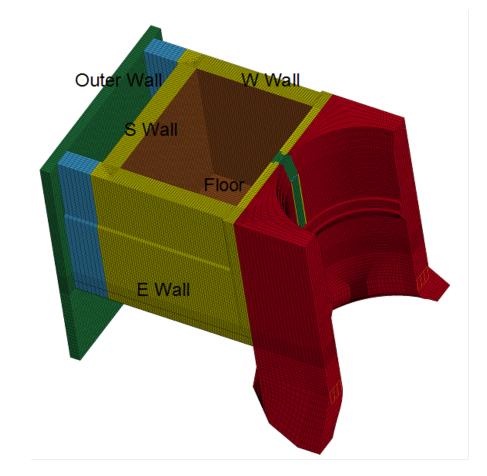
Finite element model of the SFP structure with labels for the floor and walls
